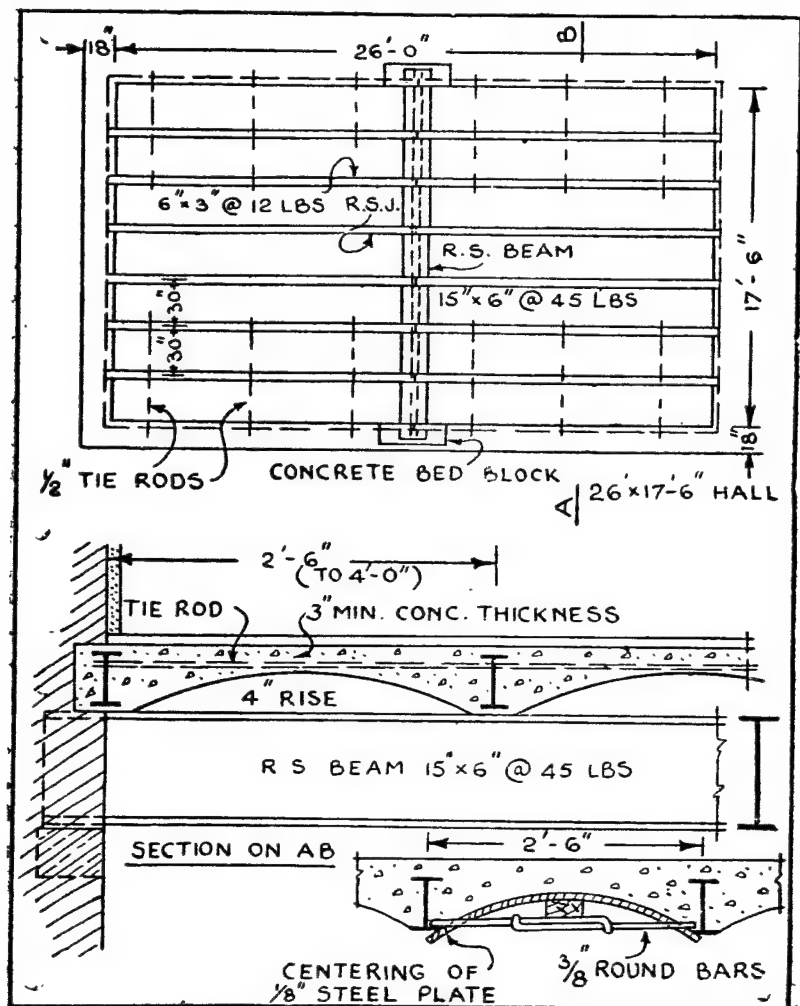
Plan showing the general lay out of the R. S. beam and R. S. joists for the jack arch flooring,
